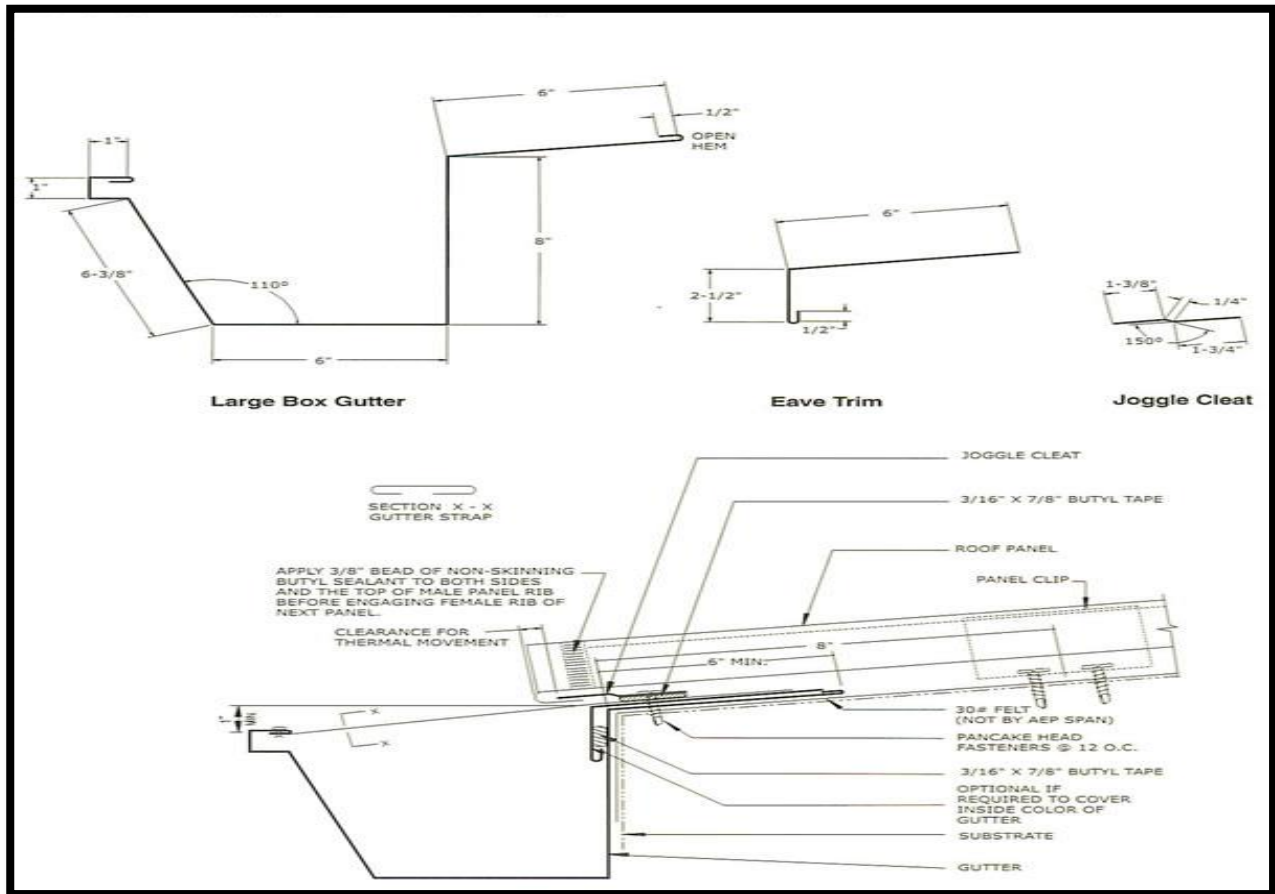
Example drawings of the proper attachment of the drip edging to the eave.
